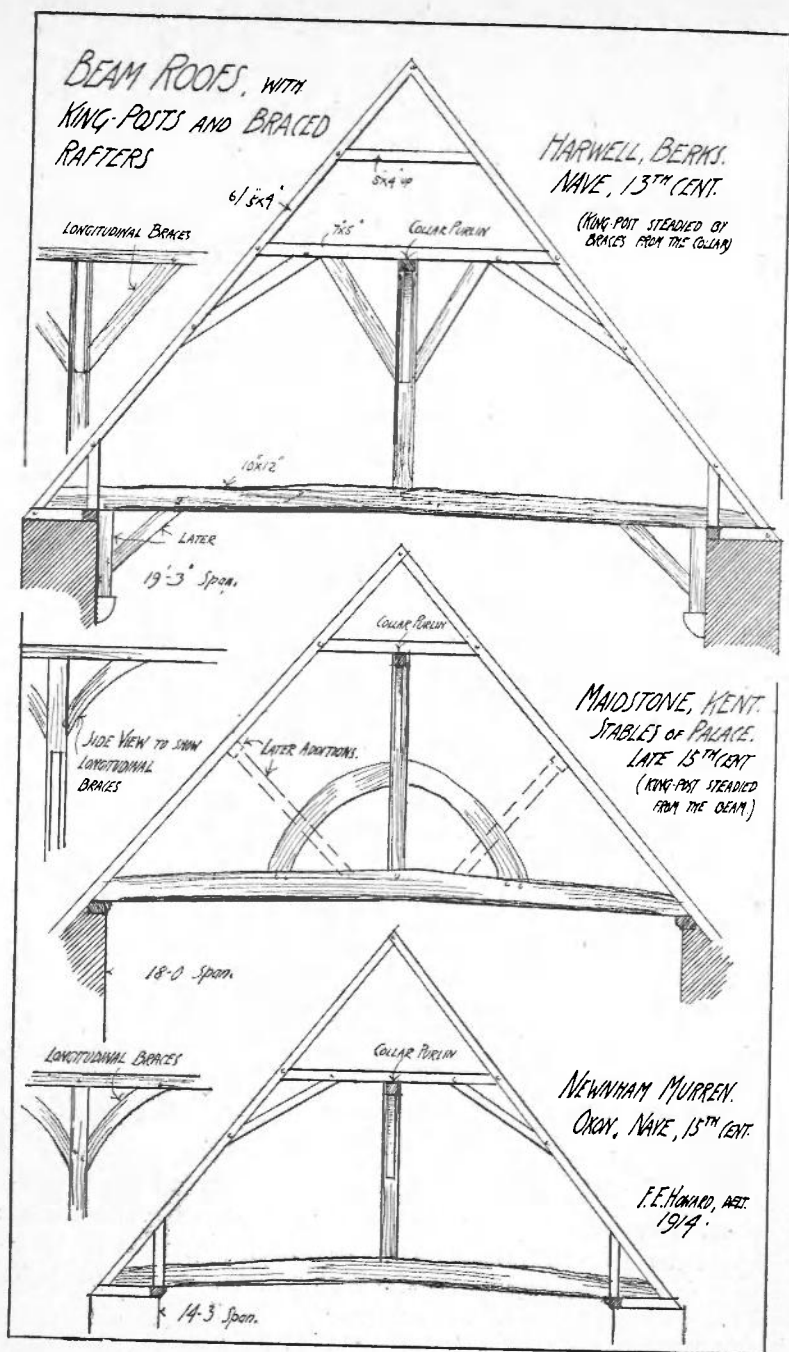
FIG. II. POST-AND-BEAM ROOFS WITH BRACED RAFTERS.
